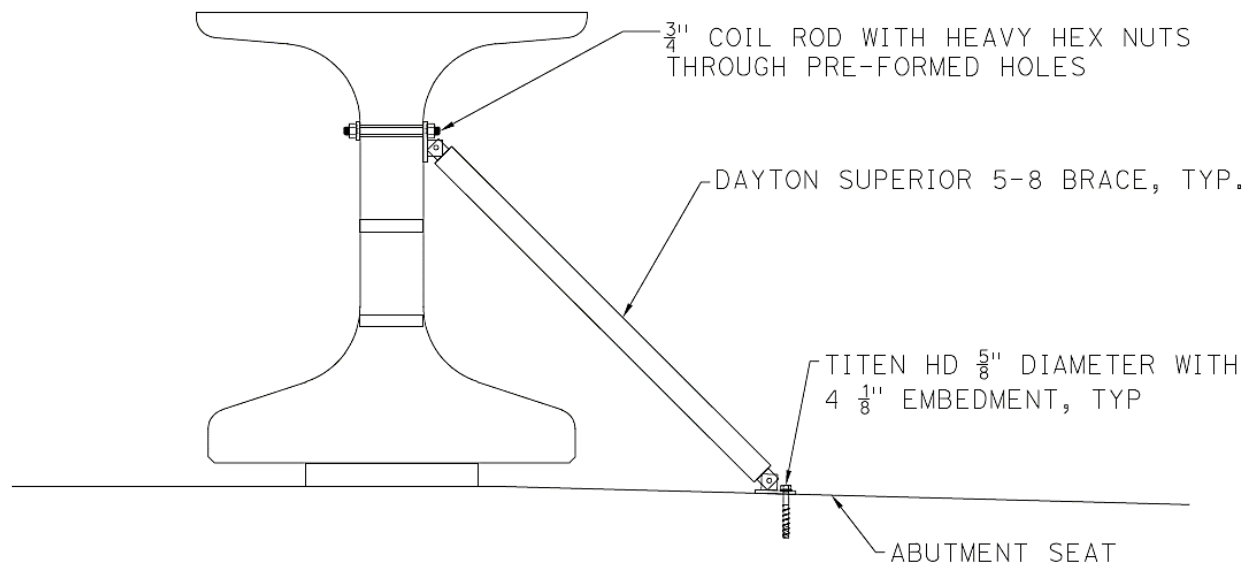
PC PS Concrete Girder Bracing Detail – 1st Girder
